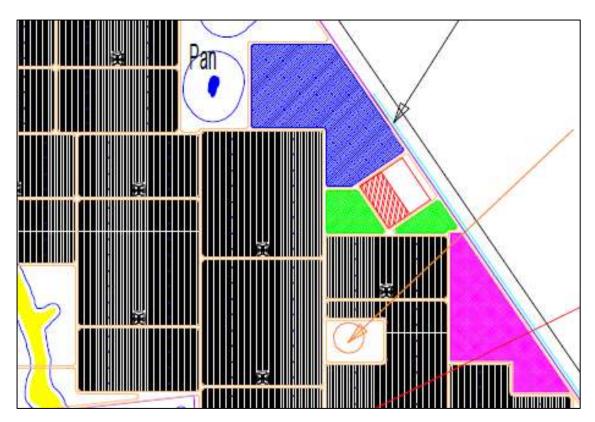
Excerpt of Site Layout plan, showing the proposed position of the BESS (blue polygon) within the authorised footprint.
